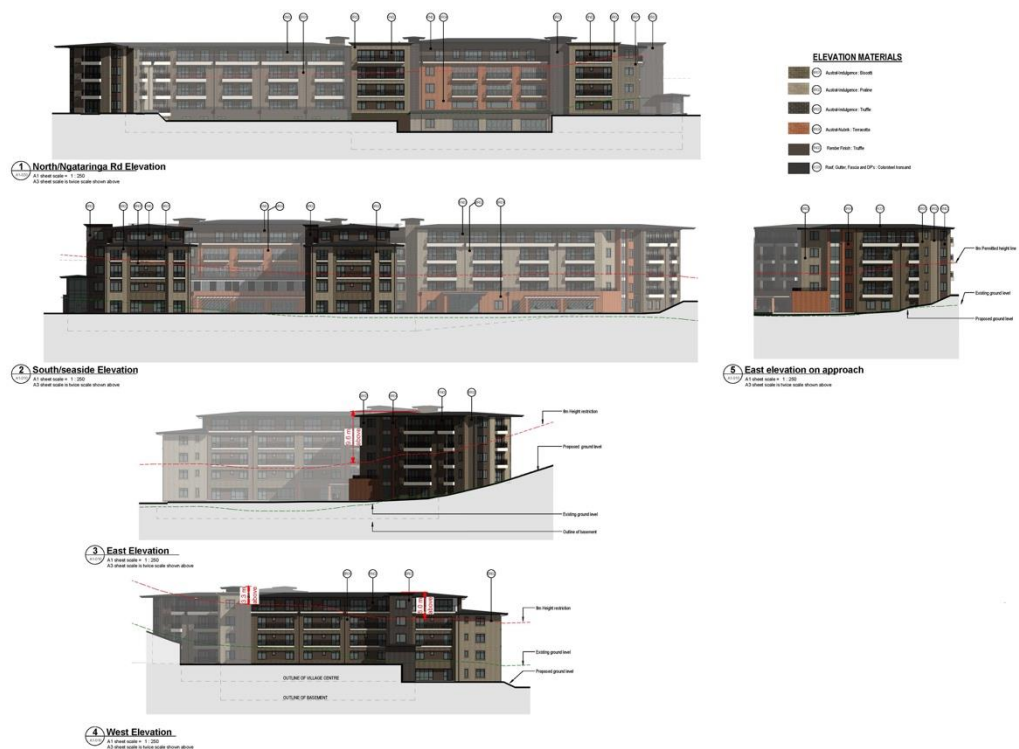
Top to bottom: the north, south, east and west elevations of Building B01. The image on the right is the east elevation on approach from Ngataringa Road (Ryman Drawing A1-010 RC16).
